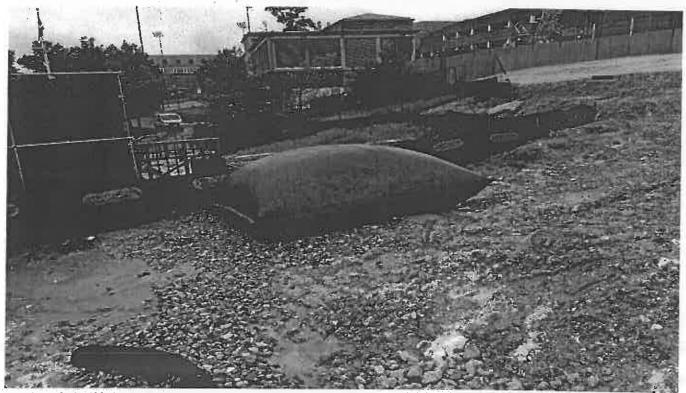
Shows filter bag placed on exposed soil adjacent the tunnel project and the Slope North of the site.
